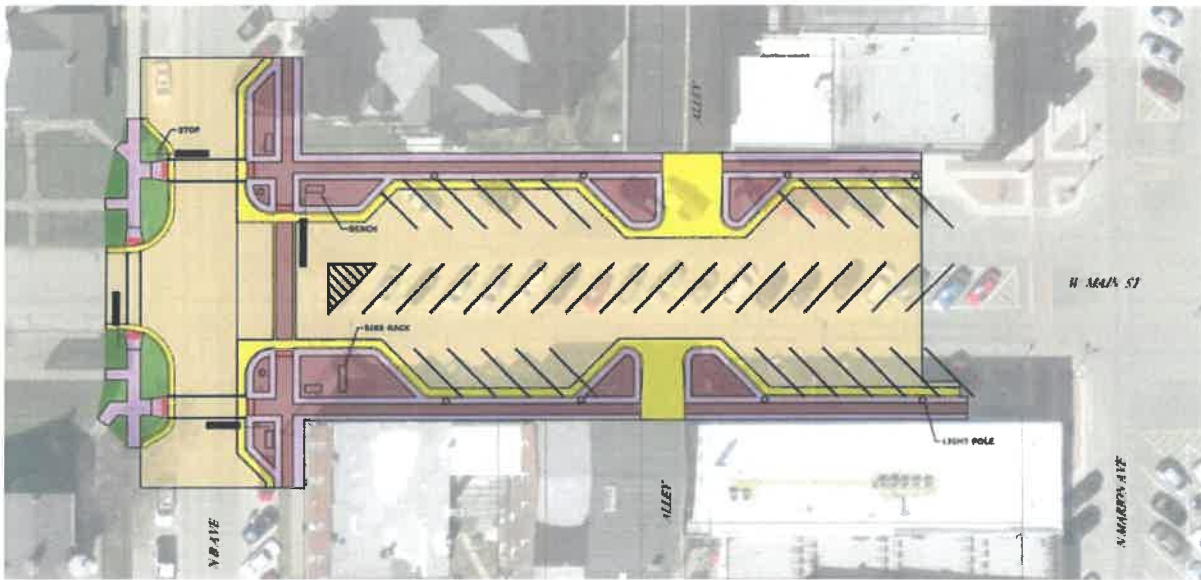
W. Main Street Area Downtown Streetscape Concept Plan
